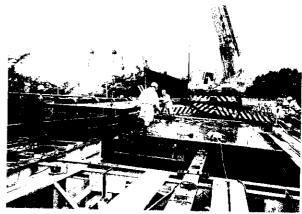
Renewing works of damaged bridge deck by steel deck
